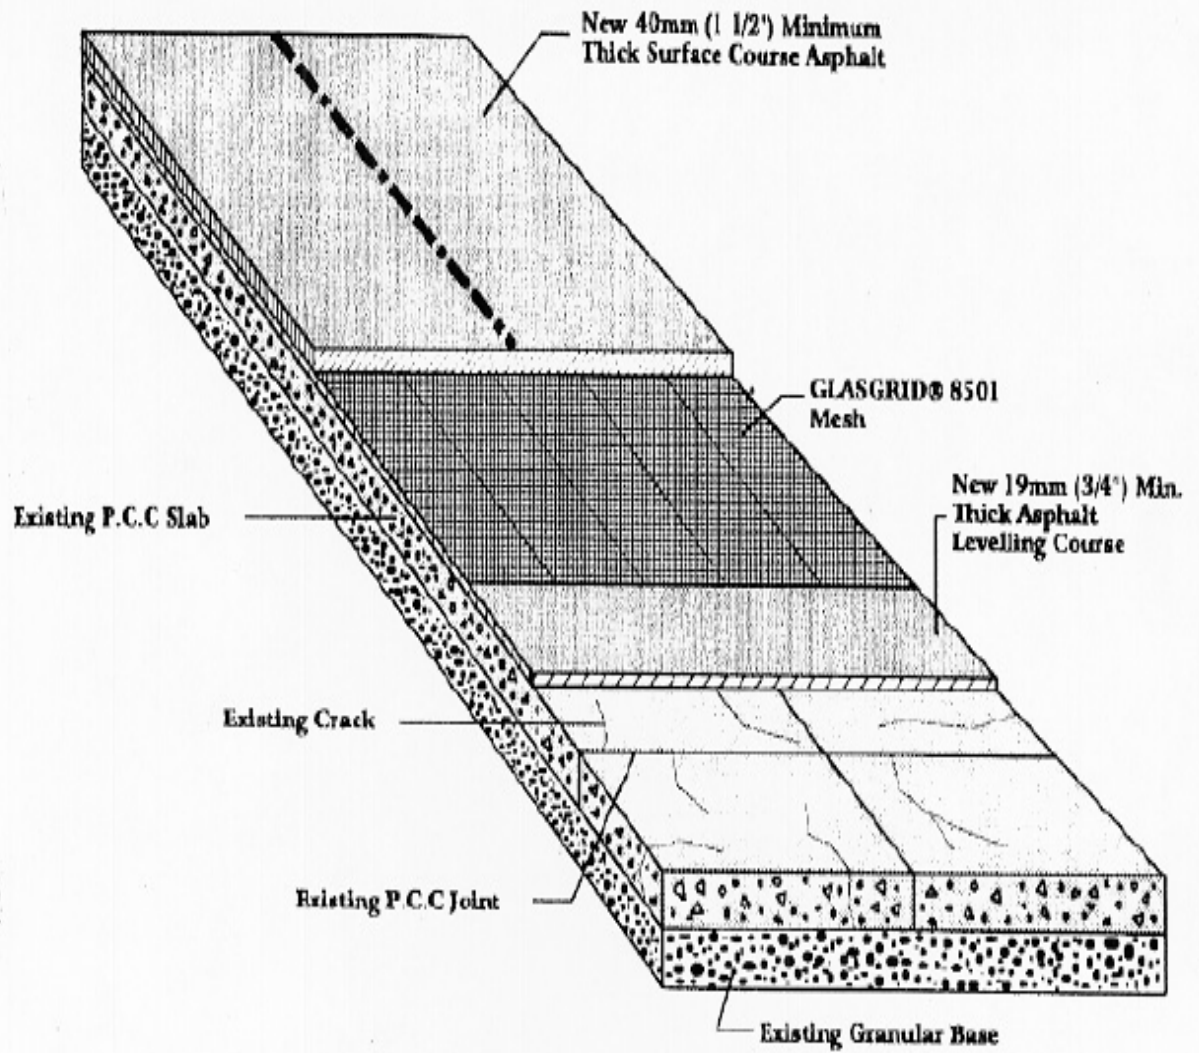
GlasGrid Pavement Layout (GlasGrid Tech Manual 2000)
